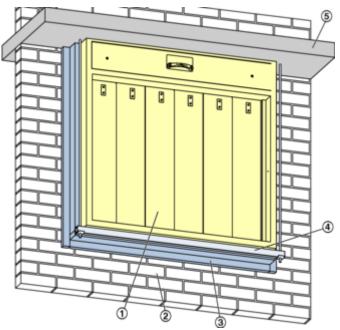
Dry mortarless installation on solid wall EI 90 S v_{ew} , solid external wall or solid shaft wall EI 120 S v_{edw} - Single occupancy of the installation opening
